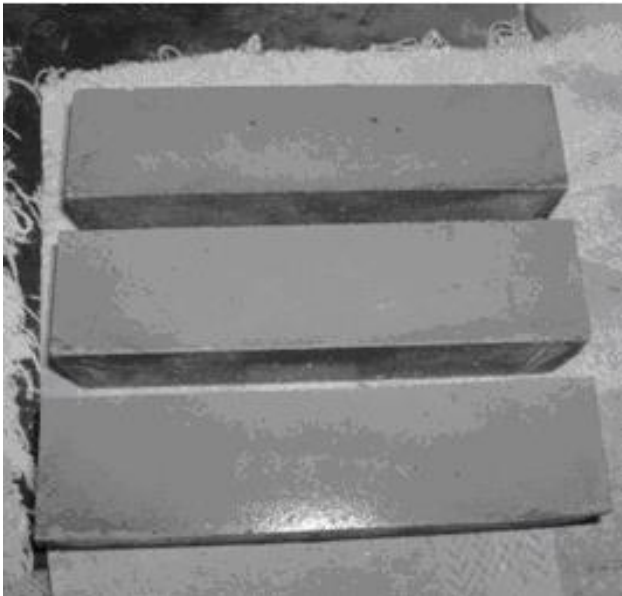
Prismatic specimens (40 x 40 x 160 mm)
